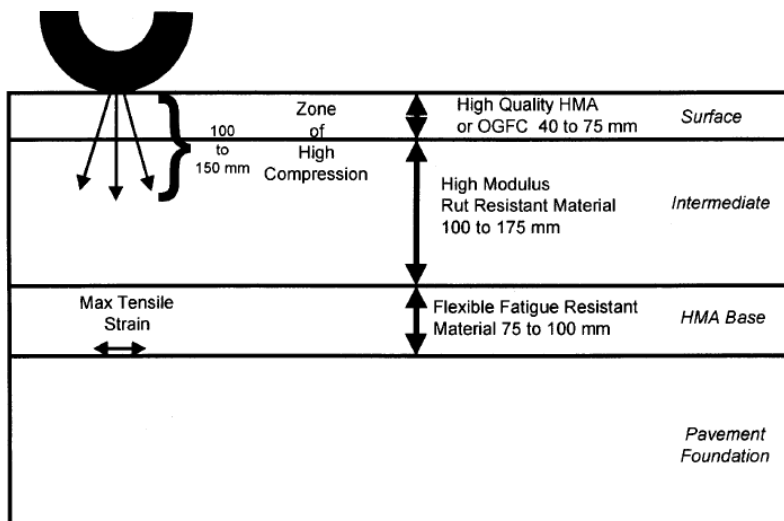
Long life Flexible Pavement Design Concept. (Newcomb et al., 2001)
